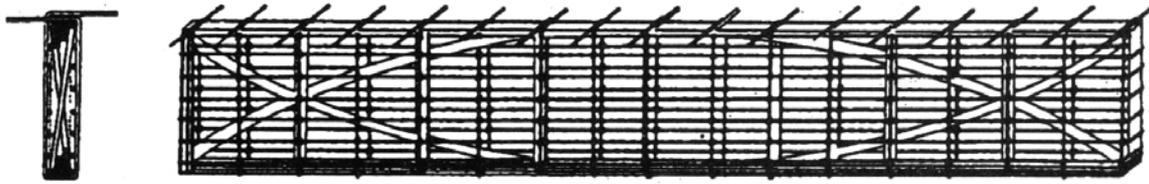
Reinforced concrete beam patent design, Monier, 1877. (Mörsch, 1902)
